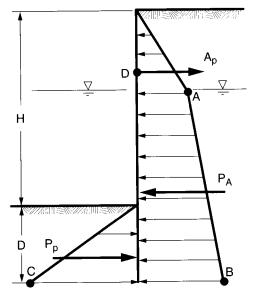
Earth pressure diagram for design of sheet pile wall. (*From NAVFAC DM-7.2, 1982.*)
